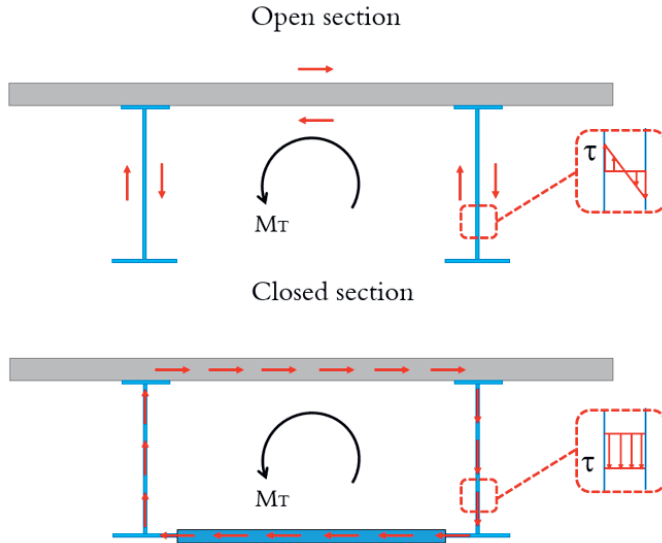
Shear flow from St. Venant torsion in an open- and closed cross section.
